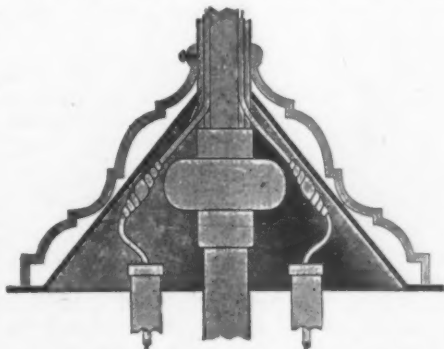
Fixture Insulated with the Canopy Insulator.
